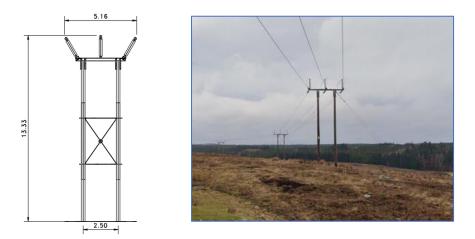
Proposed L7 (left hand image) and L8 (right hand image) Steel Lattice Tower Typical Schematic and Example Photograph
